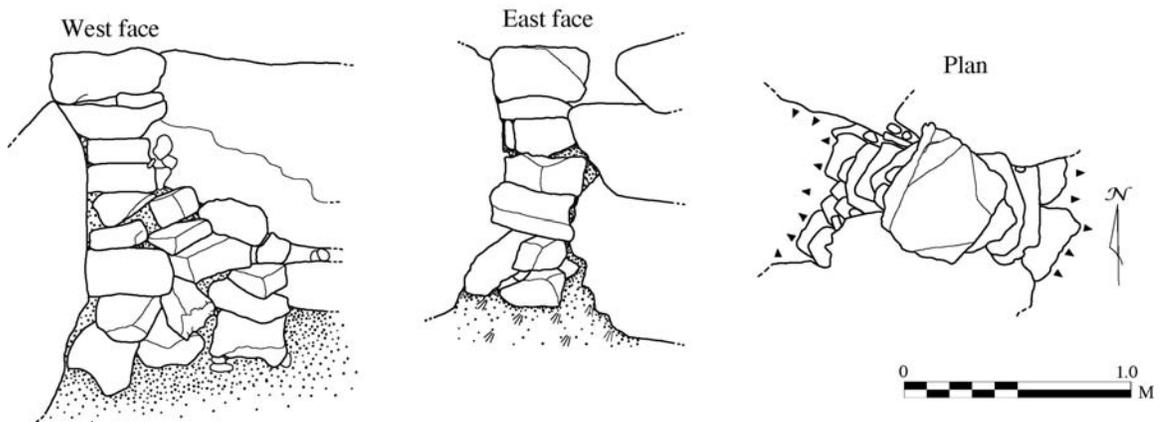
Plan and elevation drawings of Wall 4, Inner Chamber, Hidden Jar Area. For the section drawing, see Chapter 6.
